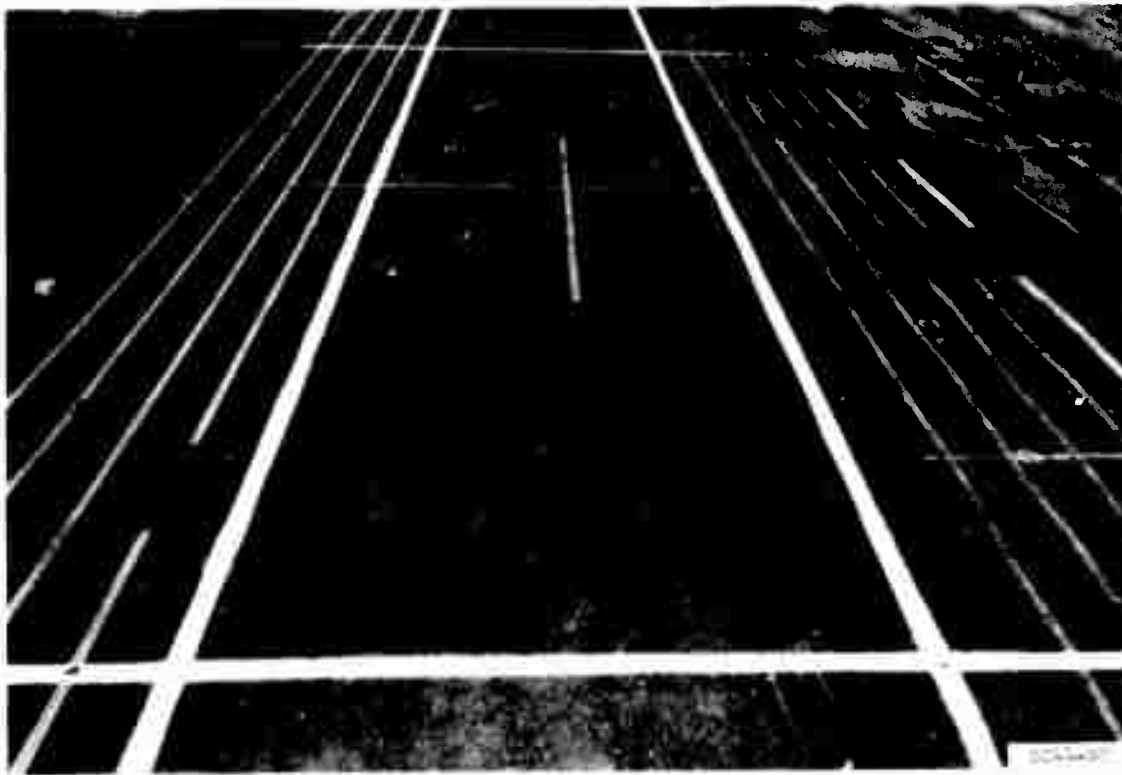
Item 4, lane 2, flexible pavement test section, prior to traffic
